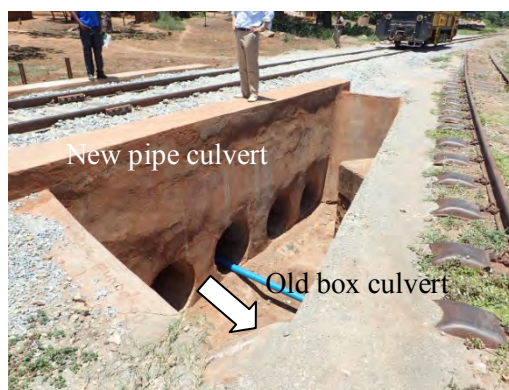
New Pipe Culvert (4 Pipe Culverts) at u/s Side of the Old Box Culvert (2 Barrels, Rectangular)
